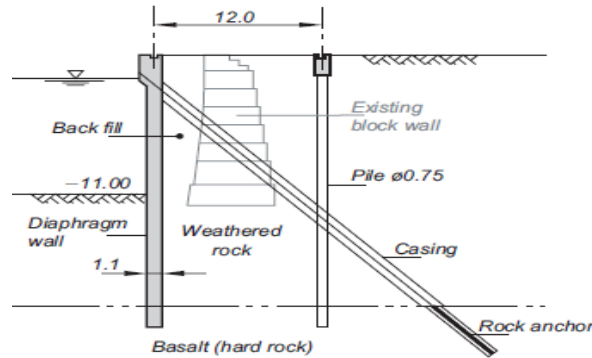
Renovation of a quay wall, Goa, India. (Broeken and De Gijt, 2014)
